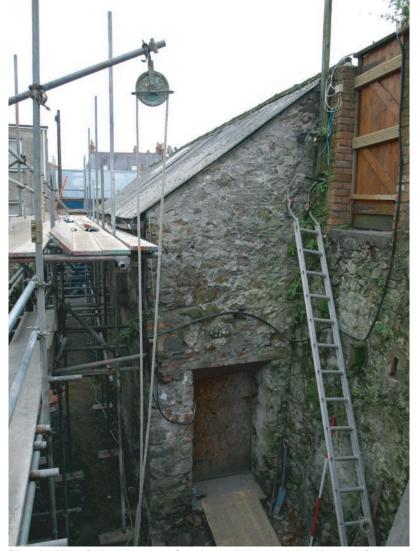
West facing elevation of storage building No.1. Looking east from scaffolding.
